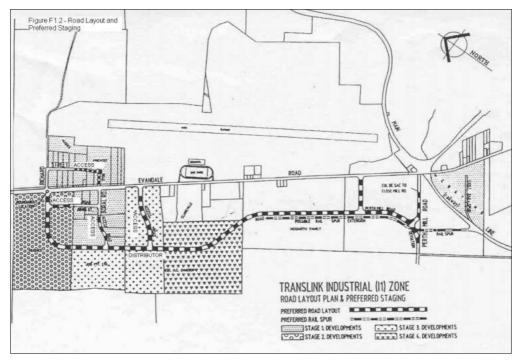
Road layout plan as required by clause NOR-S1.8.1
